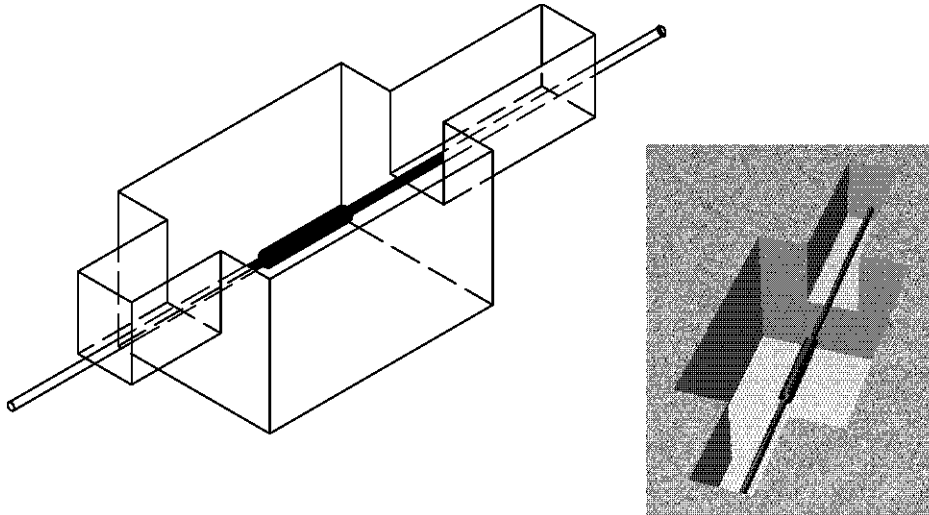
Suggested location of excavated load and plant in relation to the excavated worksite.
